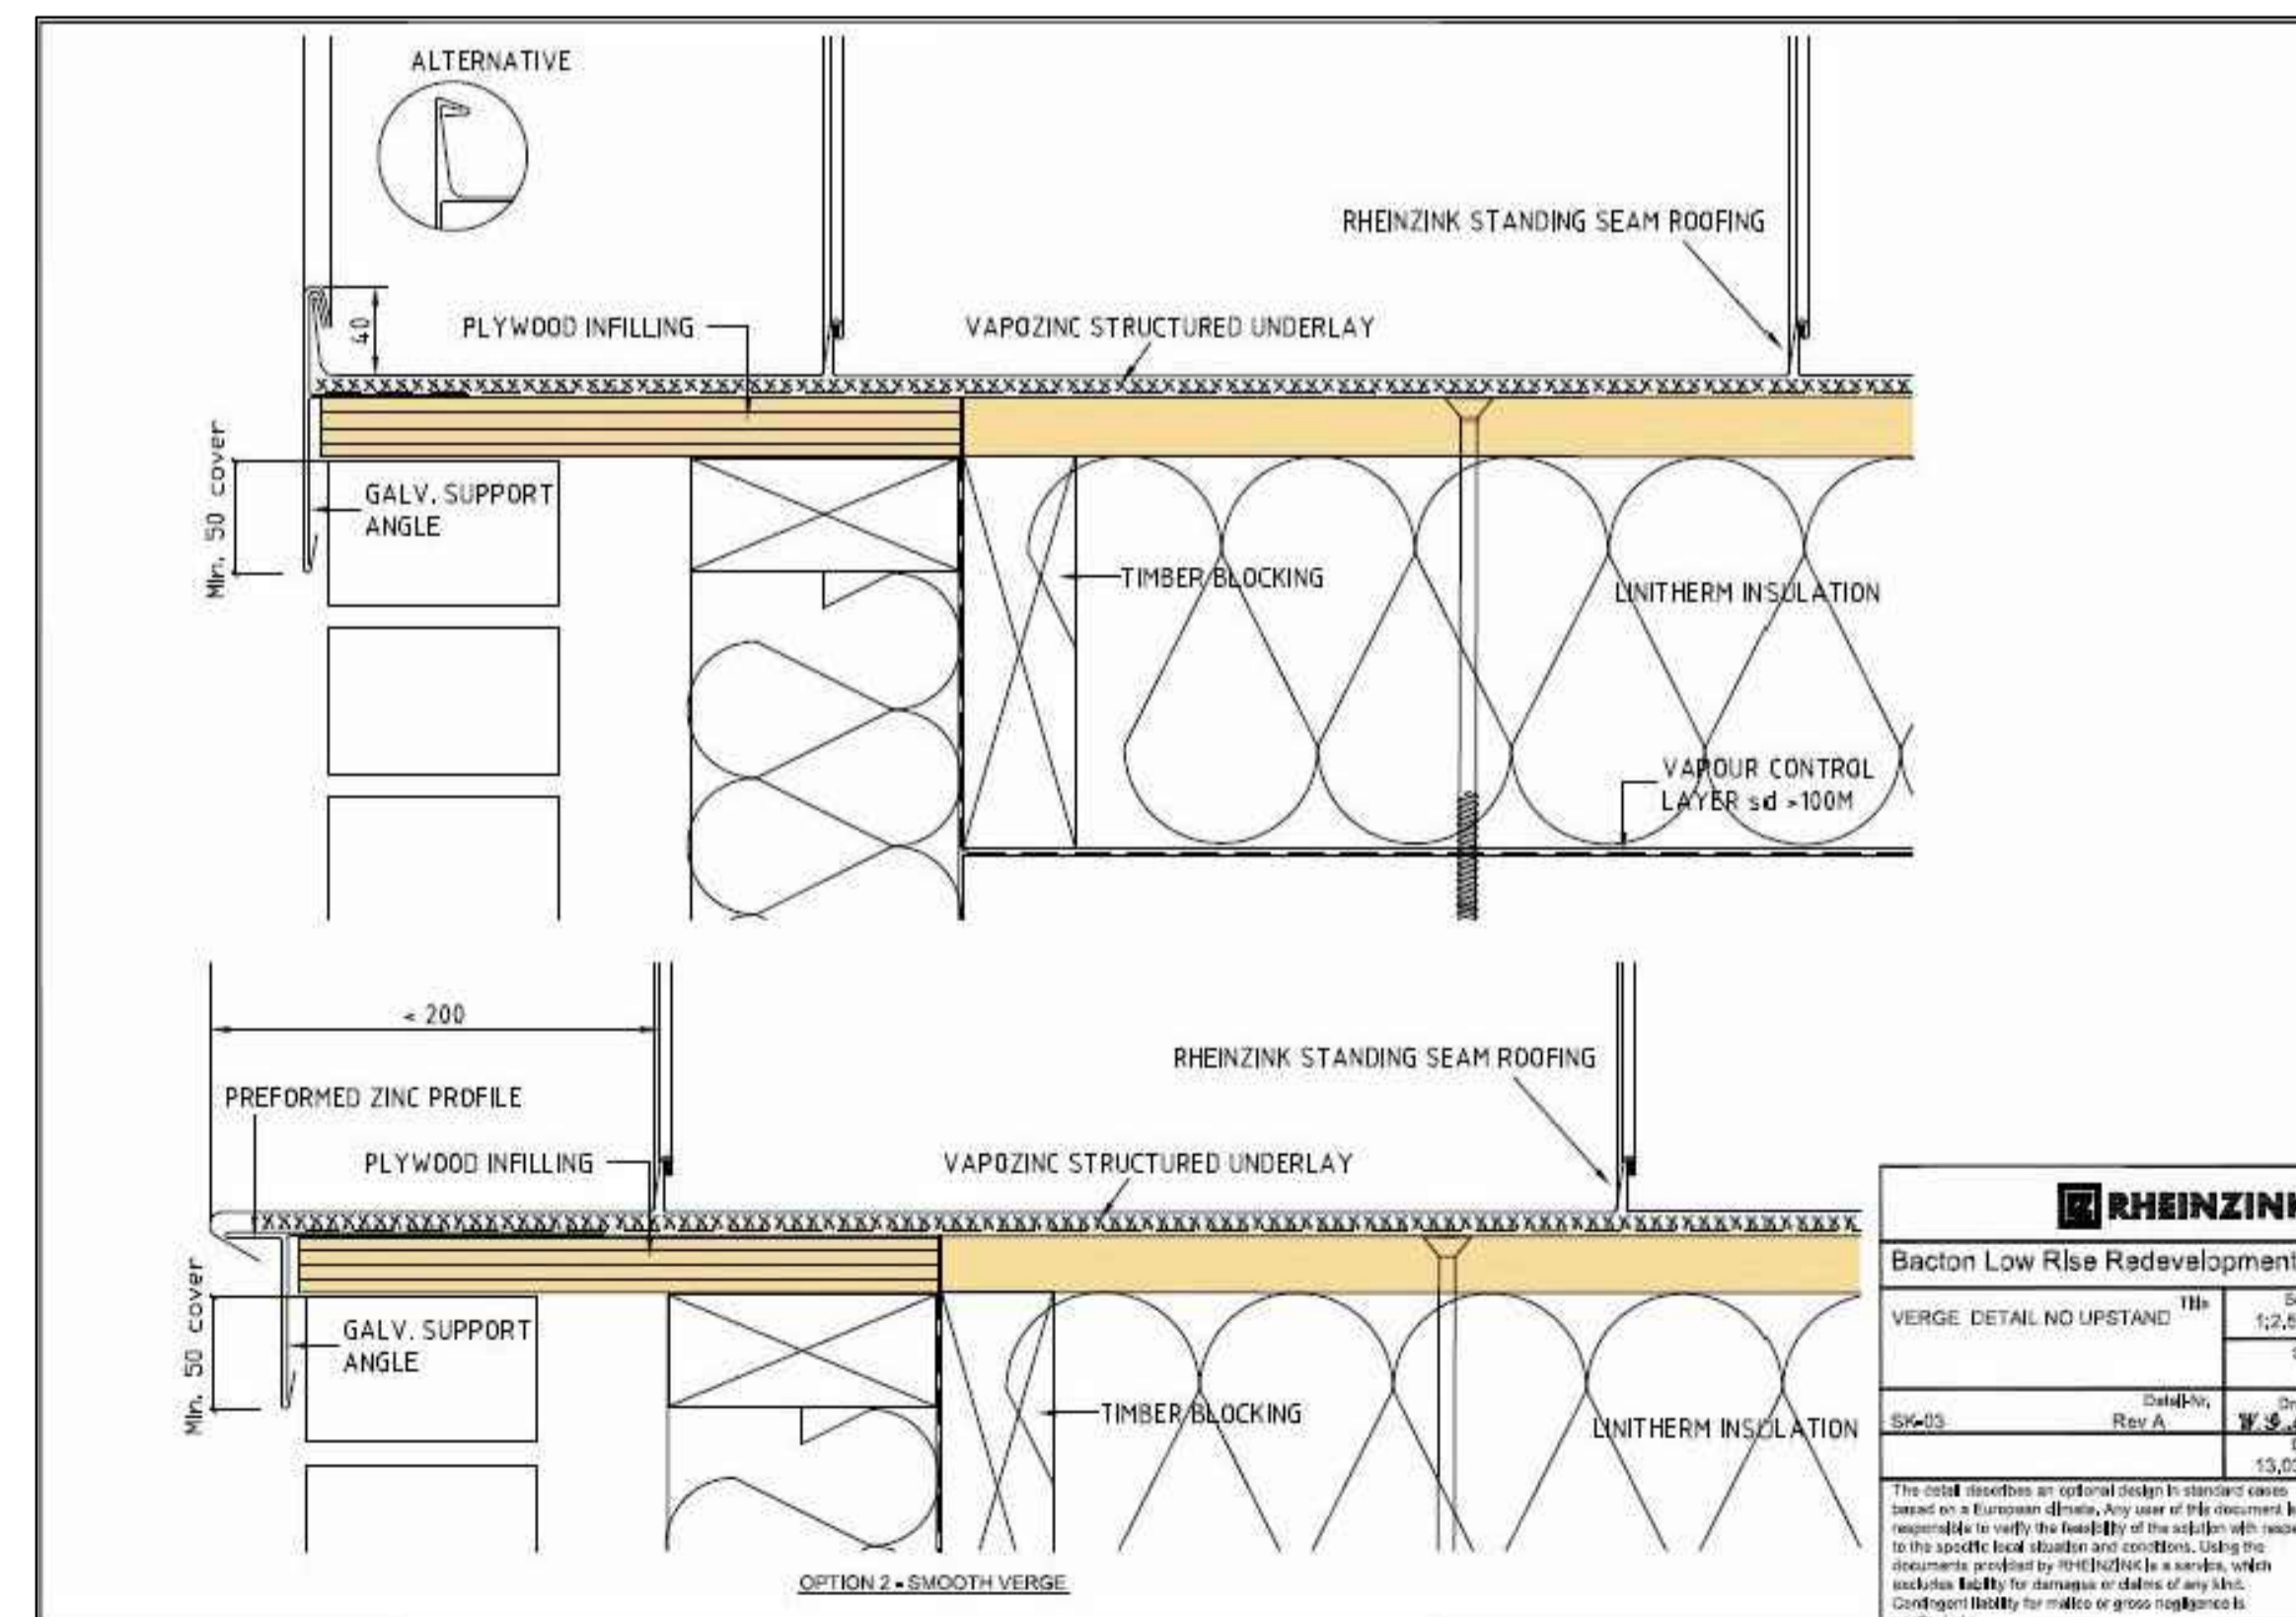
DETAIL - Block C - D-J-RC222 - Verge detail (L09 GL H/J-09)
